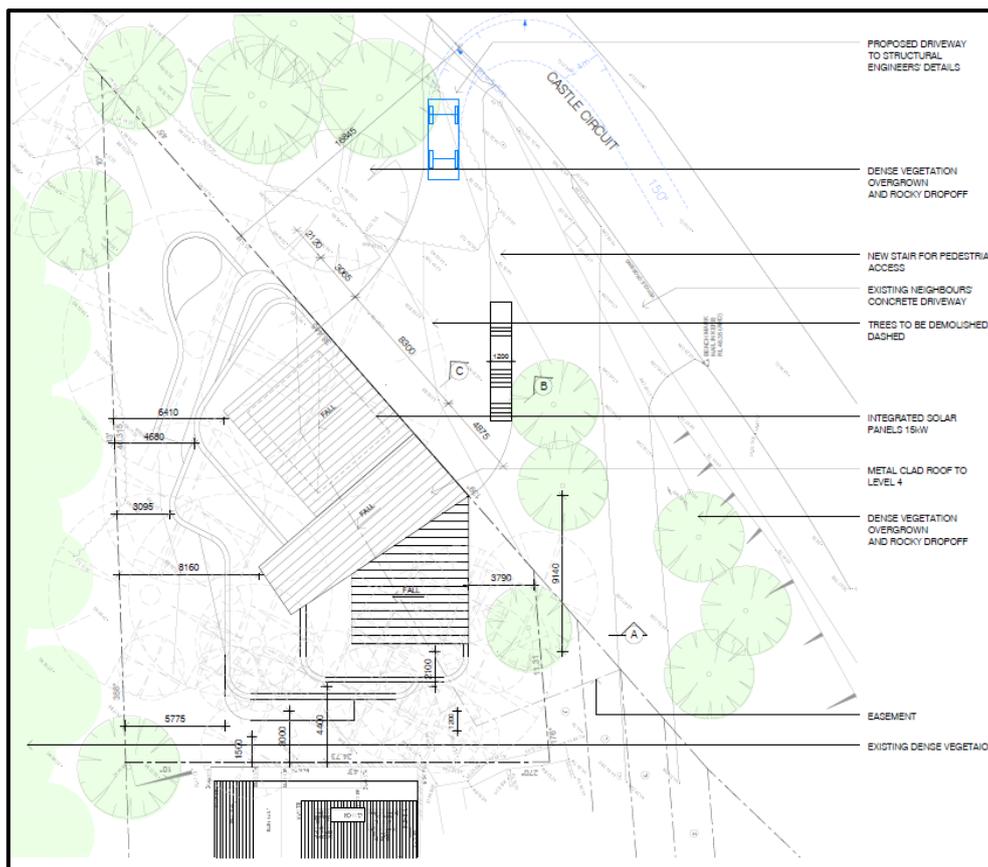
Excerpt of the Site Plan noting the deletion of the southern stair access associated with the adjacent access driveway area to the east of the subject site and retention of pedestrian access to the north
